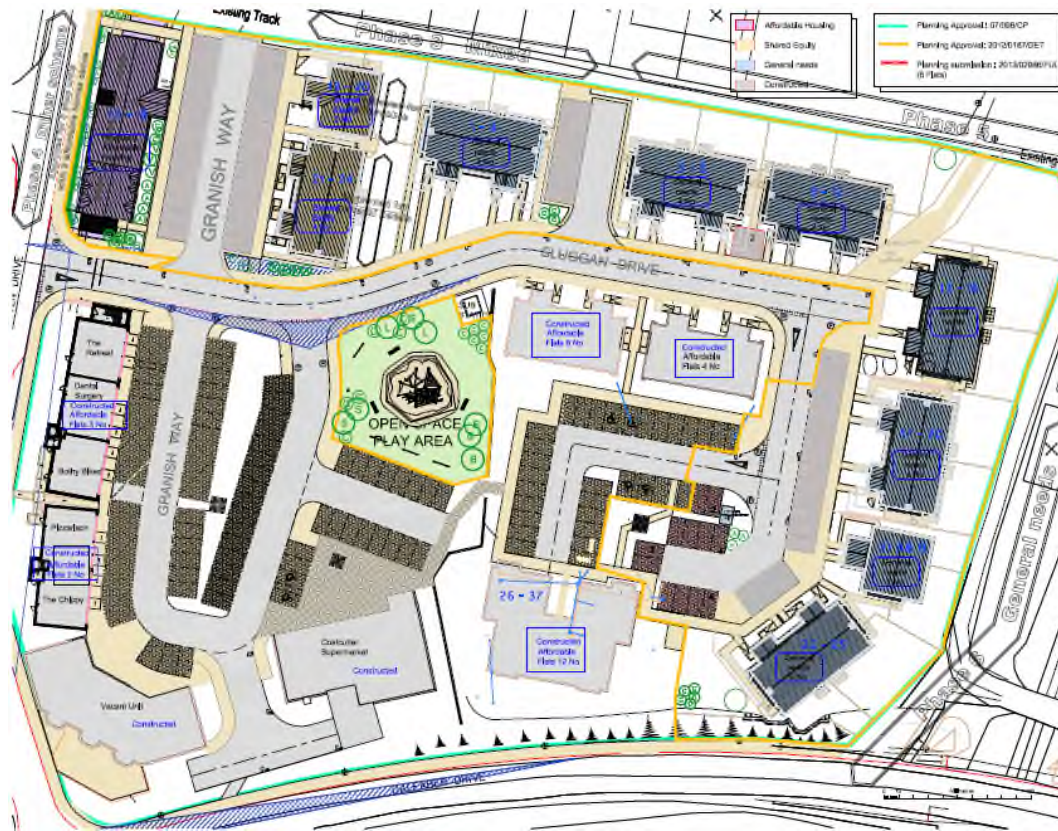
Overall Site Layout (applications 07/098/CP and 2013/0240/DET)
